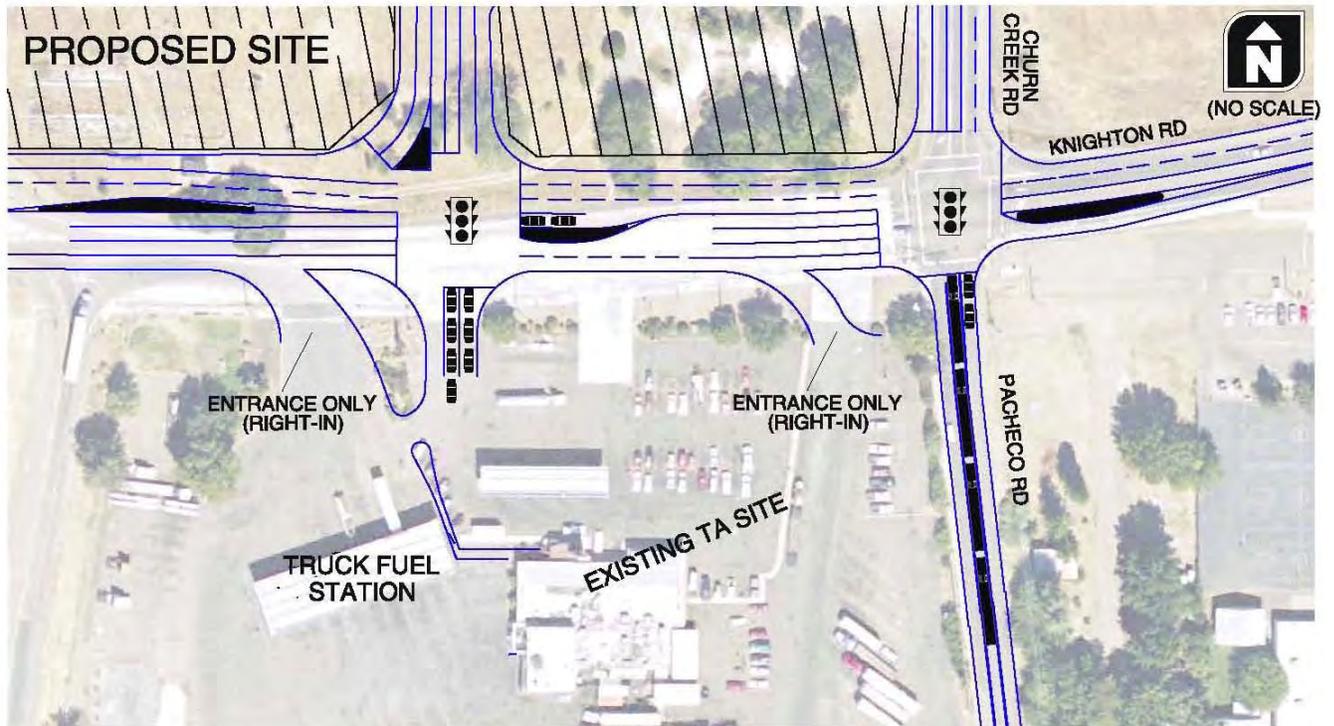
shows the proposed circulation pattern serving the TA site and proposed project. The proposed circulation plan provides a single, signalized access point for autos and westbound trucks. In addition, the existing two truck-only driveways would be constructed as right-in only truck accesses. Finally, a new outbound access point for trucks would be provided on Churn Creek Road-Pacheco Road.
